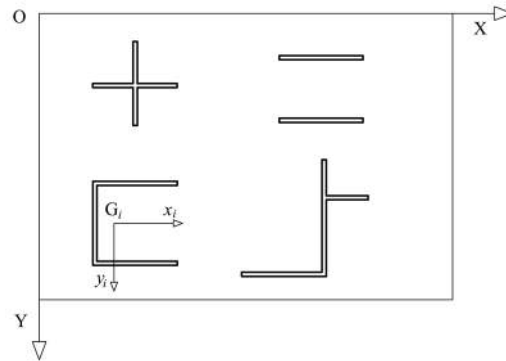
Floor plan of a tall building stiffened by various vertical bracings.
